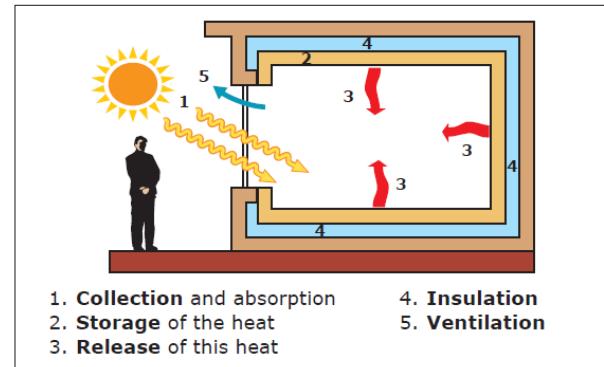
Passive Solar Building Concept [8] – Replace - refer first figure in topic Direct Gain: add a window on the front wall + flat roof
